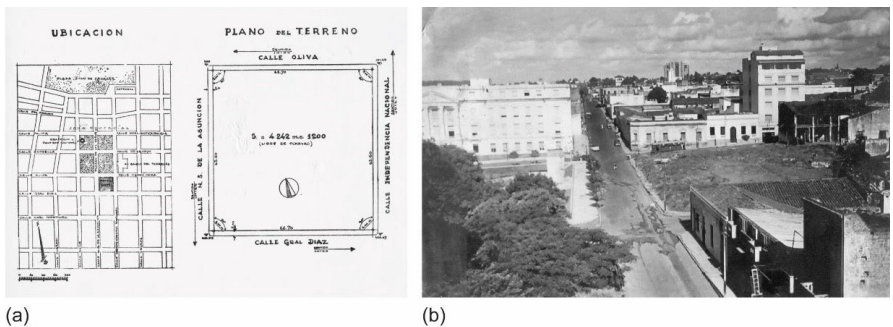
(a) Site plan and (b) aerial view of the site in the early 1950s. Source: (a: (Instituto de Prevision Social 1956); b: Javier Rodriguez Archive)
